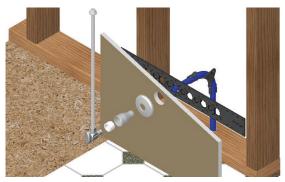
Installation Example of ProPEX Out-of-the-Wall Support System
